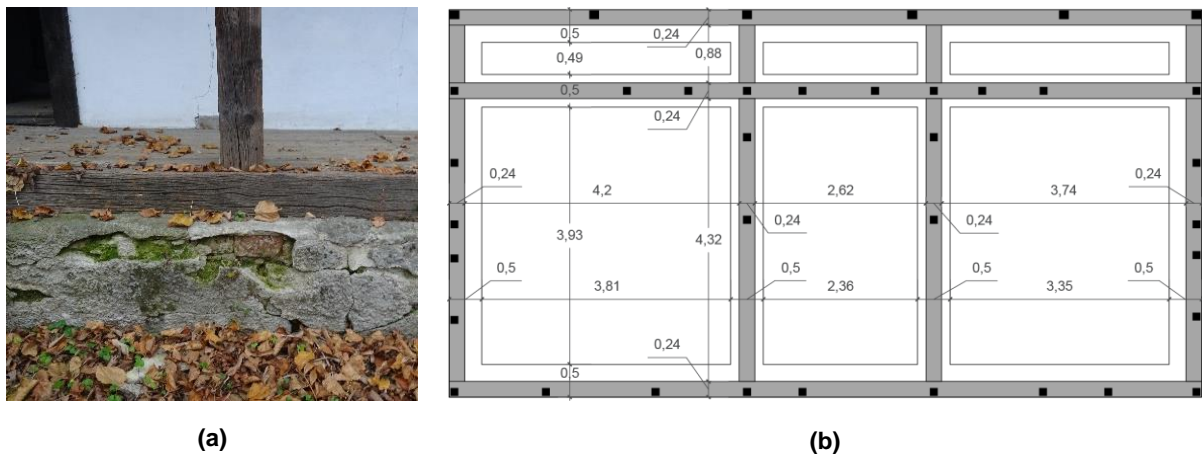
Lower beam (a) and foundation plan configuration (b).
